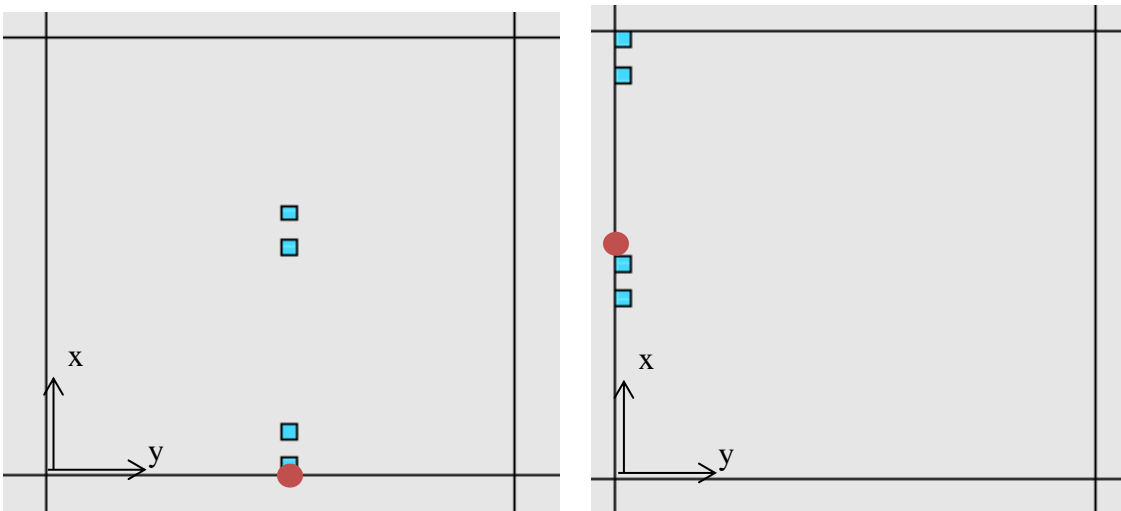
Critical location of load (blue squares) and stress (red dot) for transverse (left) and longitudinal (right) cracking of the widened slab.
